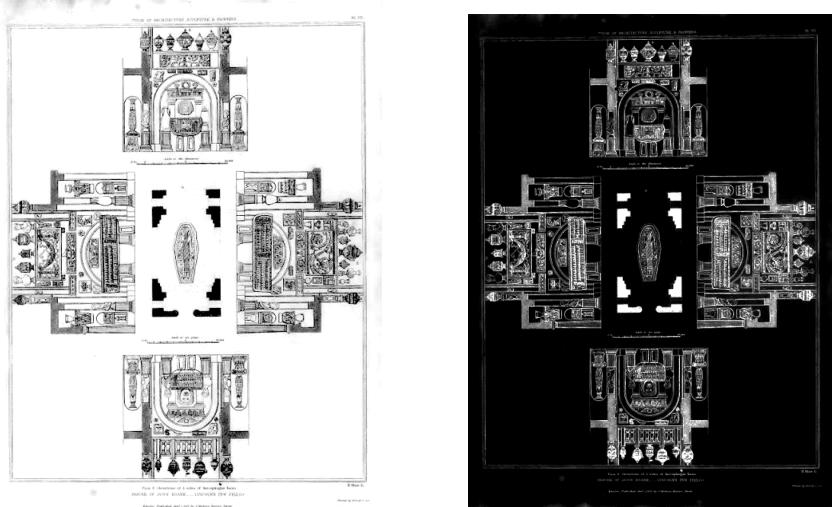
Figure and ground trans-positions of plans and sections documenting interior space of Sir John Soane Museum.
